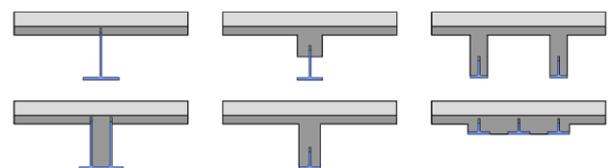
PrecoBeam steel-concrete composite cross-sections [6]
